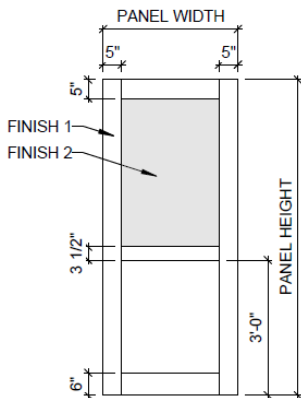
Proposed second floor porch door, 1910/1851 section.
